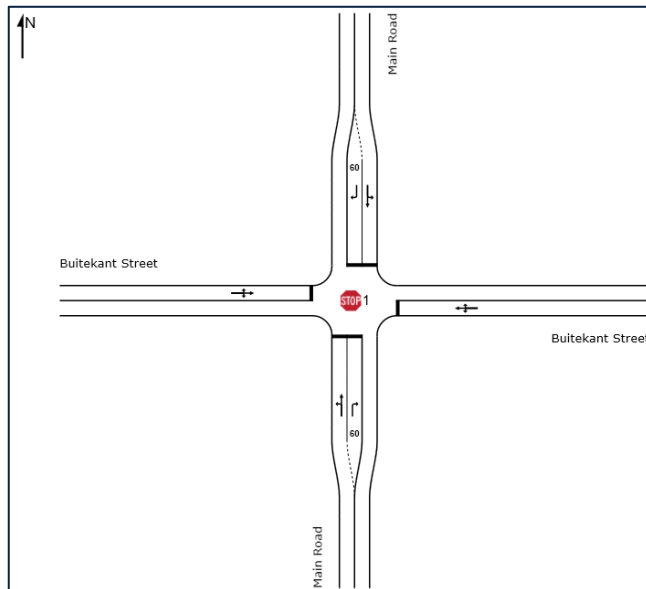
Main Road and Buitekant Street: Existing Layout
